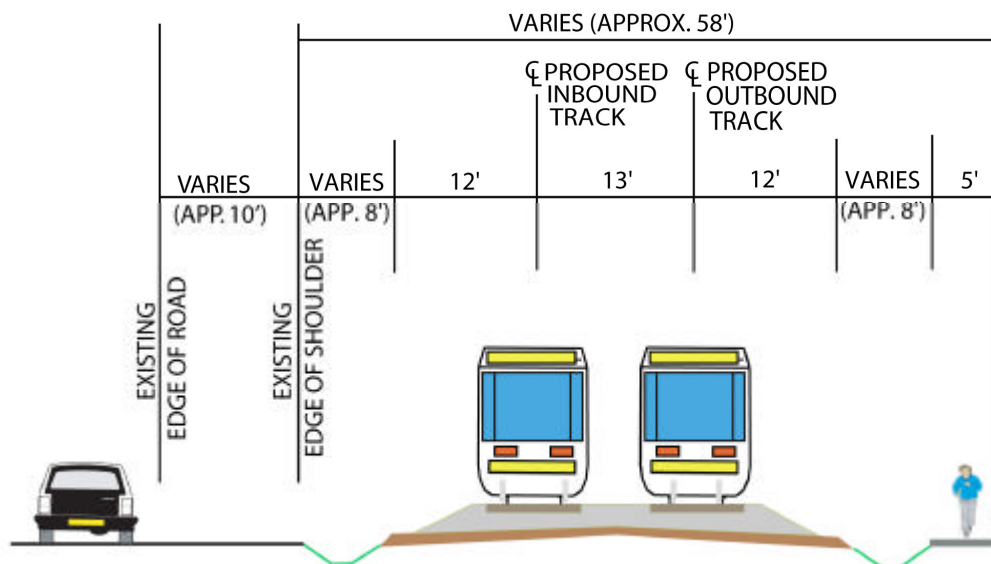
LRT Ballasted Track Section Adjacent to Pope's Creek Railroad
